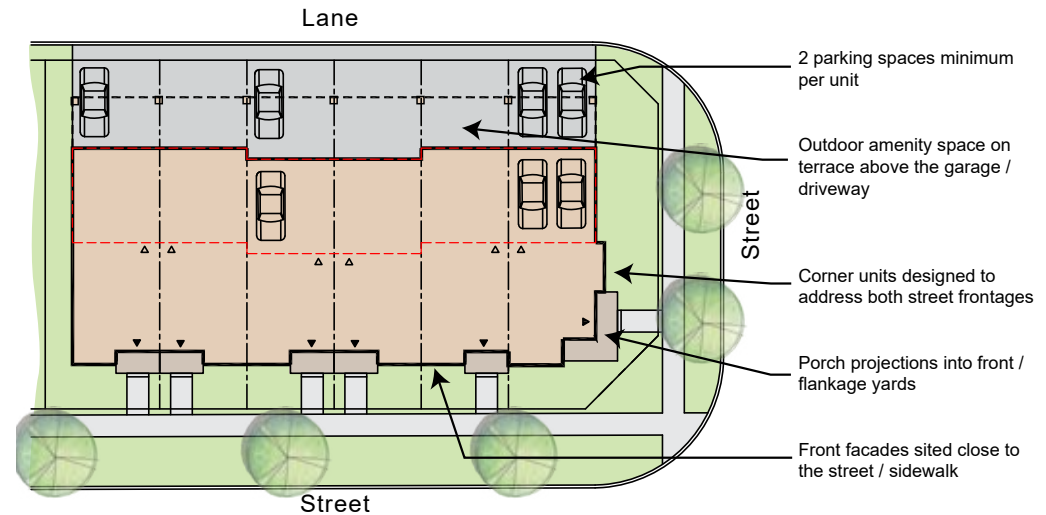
Conceptual Siting of Lane Based Townhouse Dwellings
